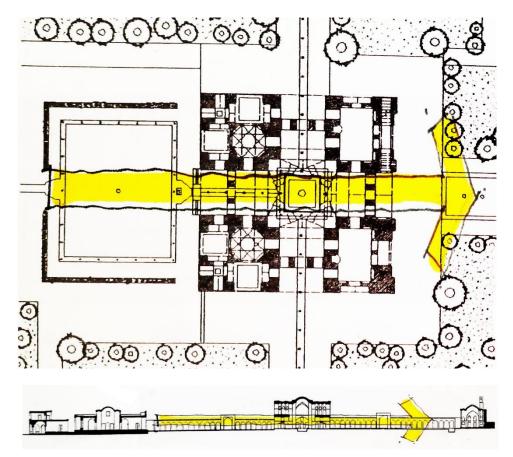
Extending the movement inside and beyond buildings, Fin Garden.
